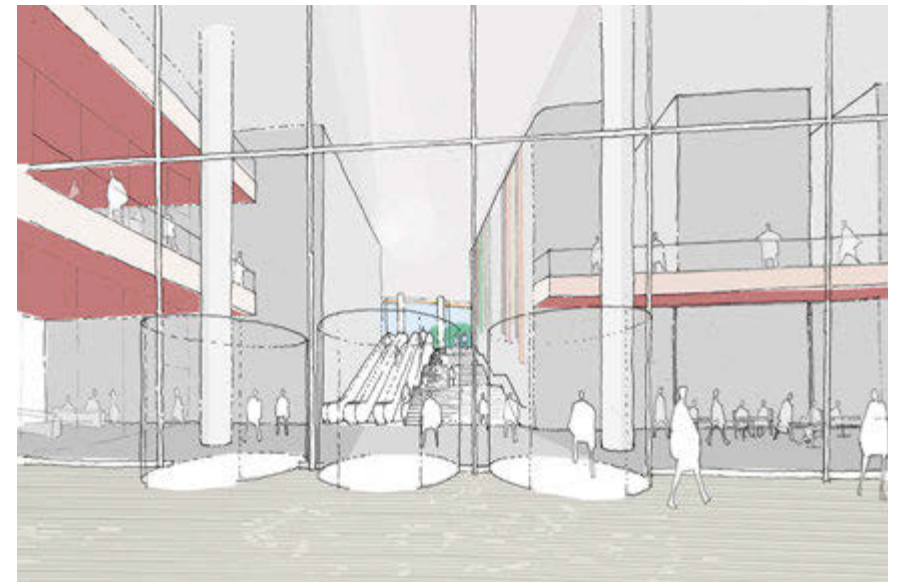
Towards Building 2 - Entrance lobby and view to Platform above
